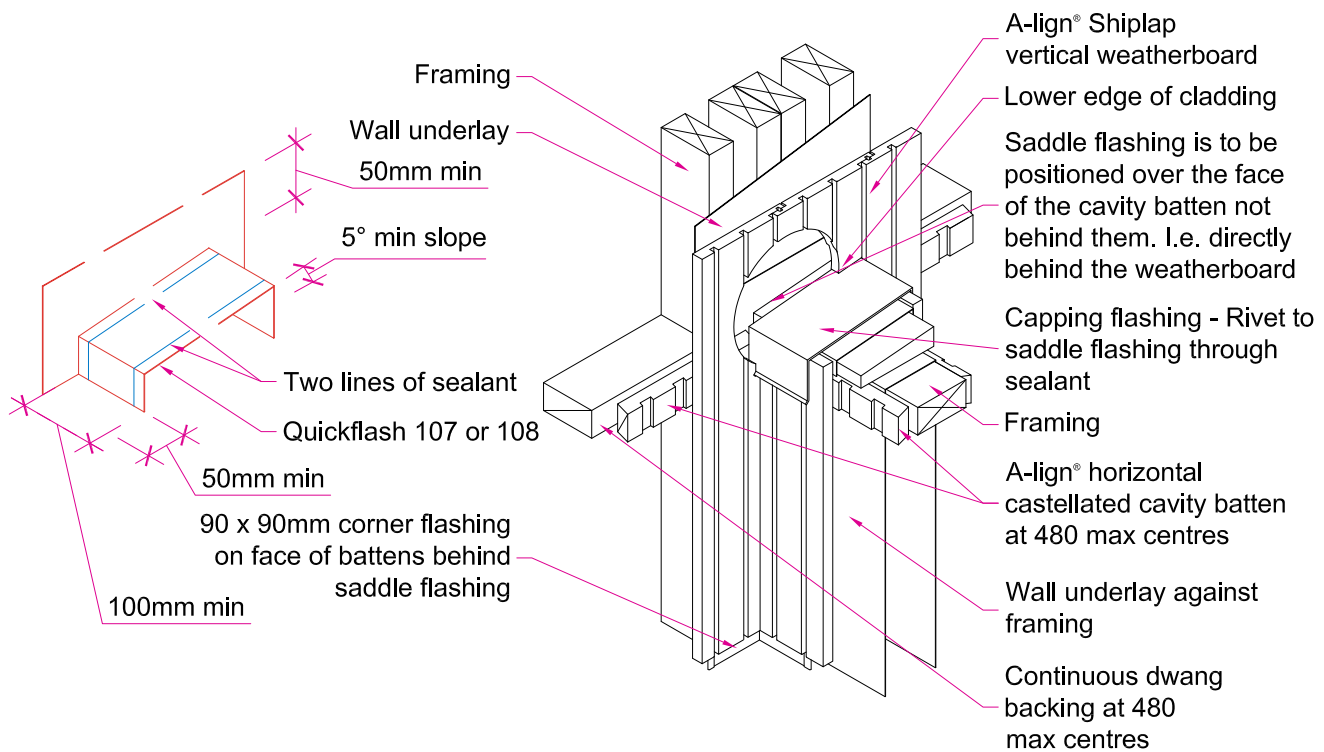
Cavity fixed – parapet – balustrade – wall junction moulded internal corner
